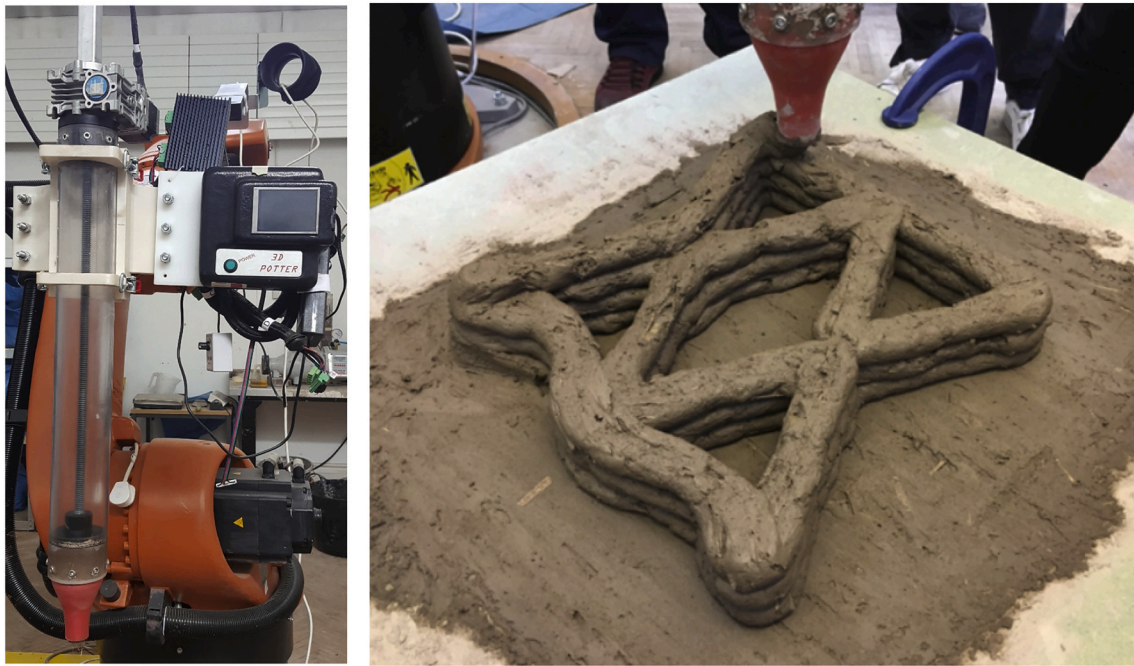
The electromechanical linear ram extruder and its 3D printed outcome.
